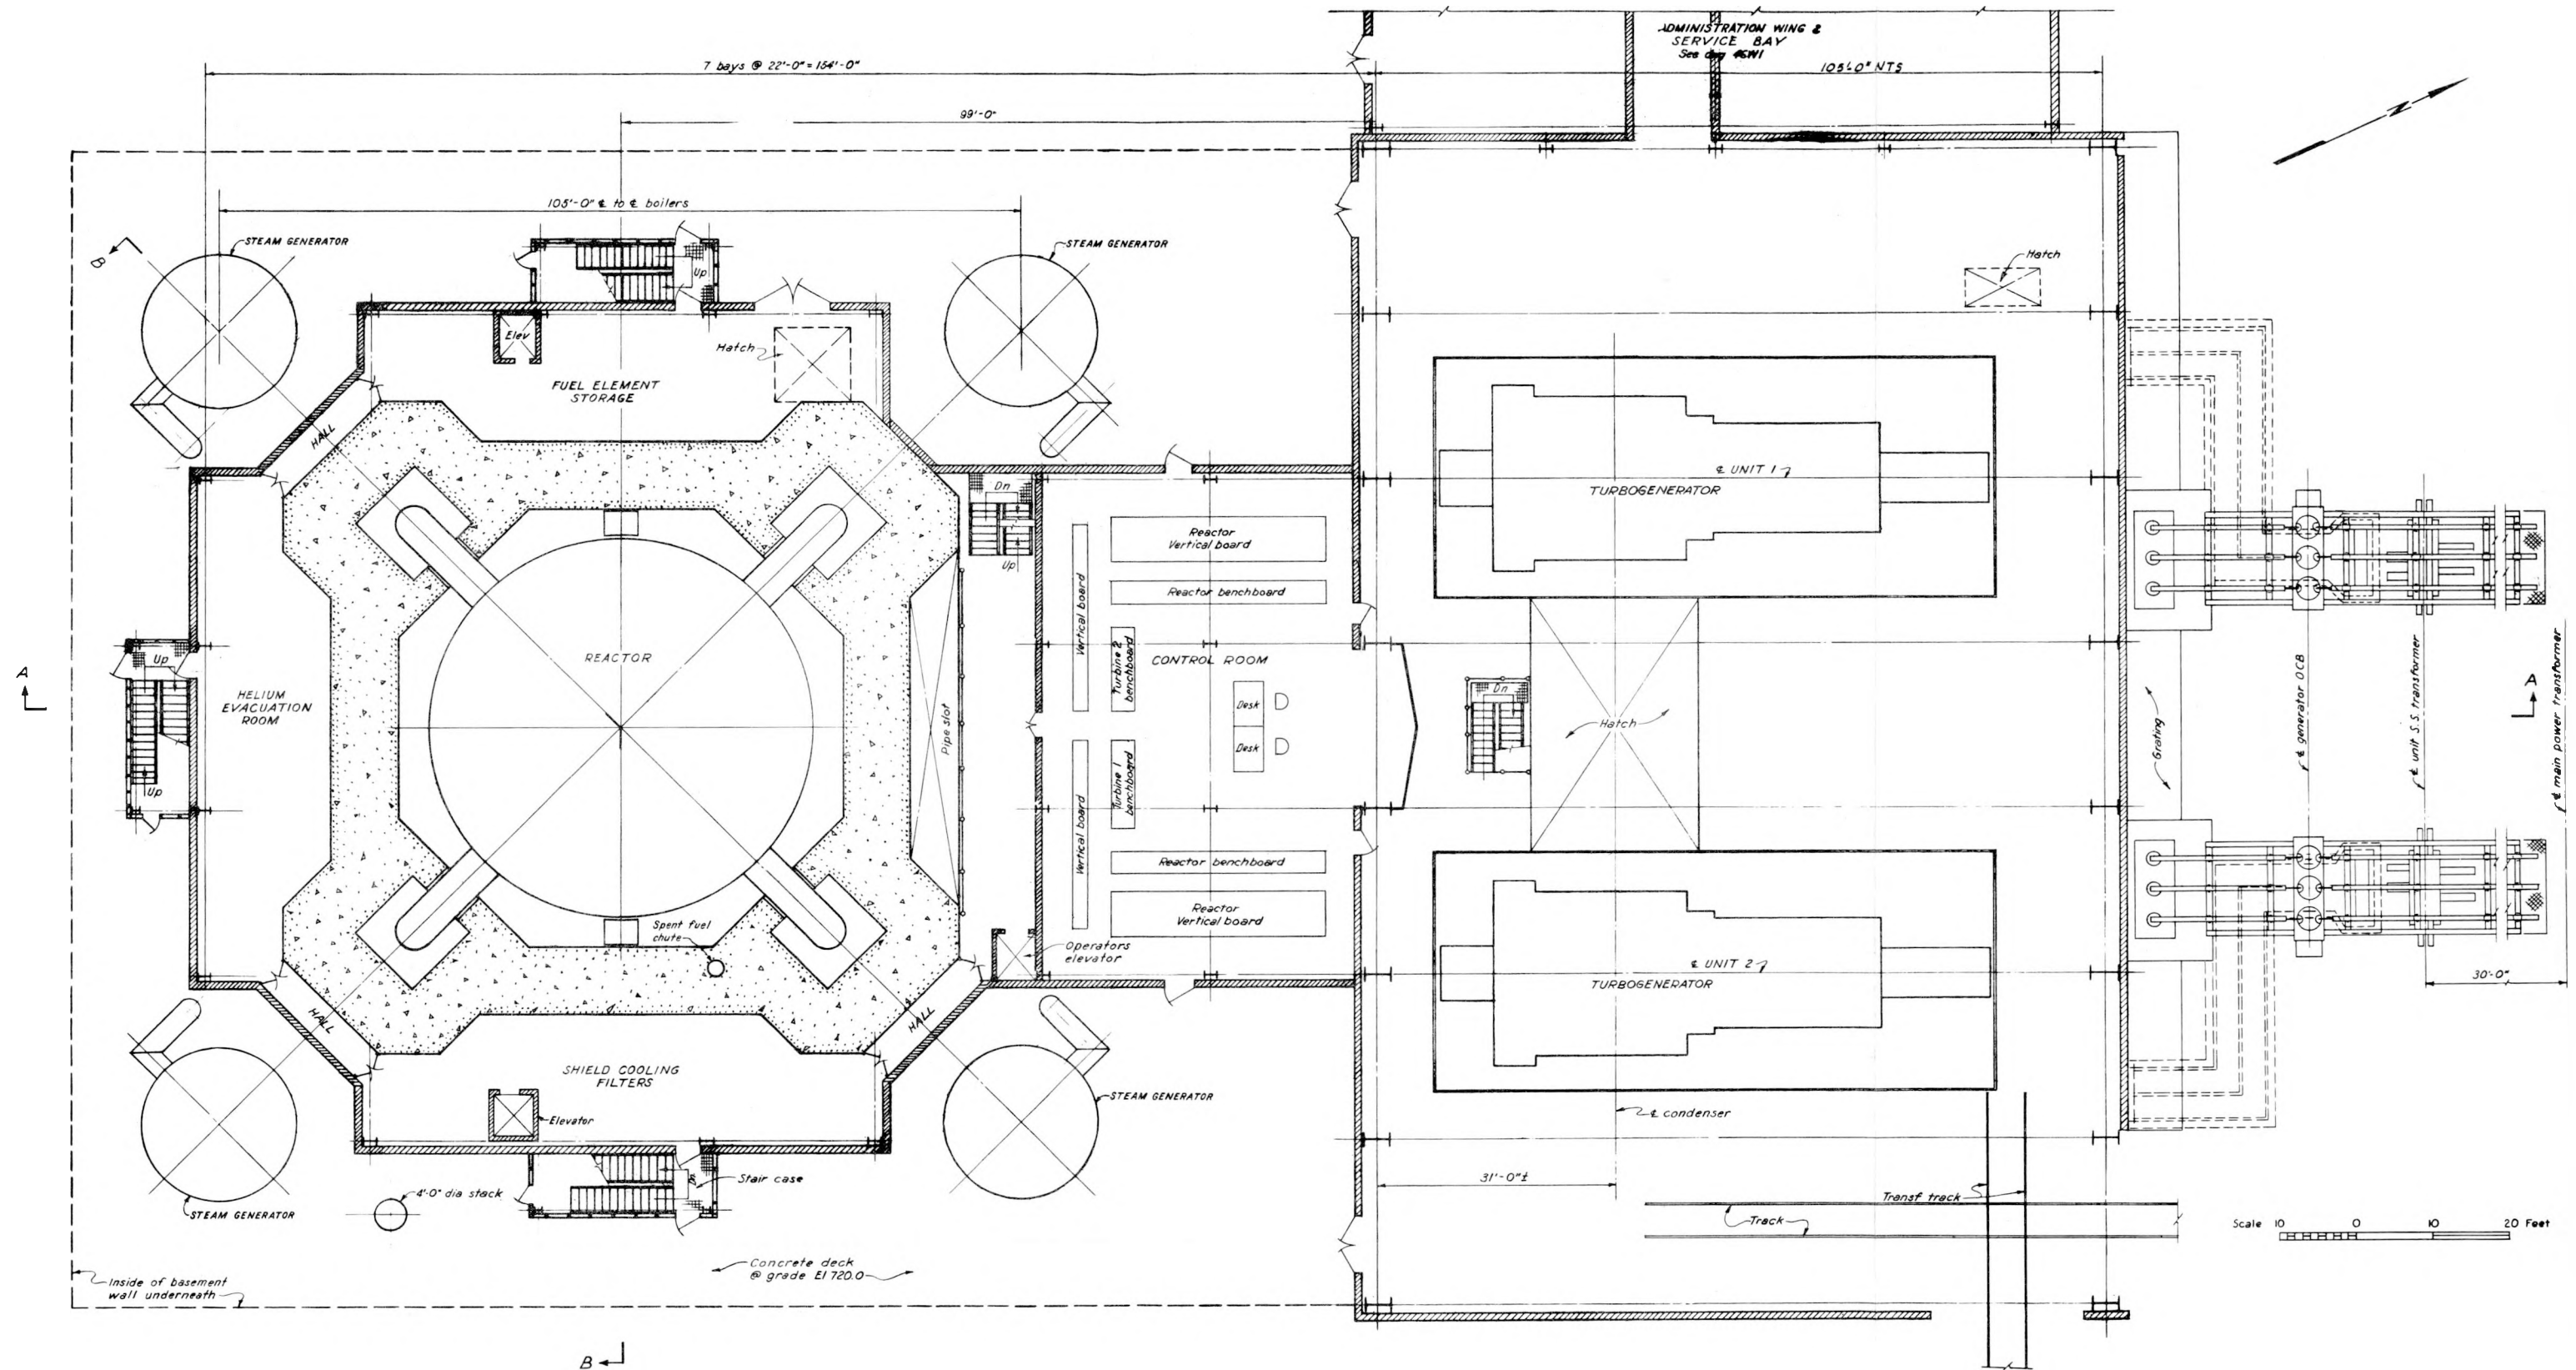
Equipment Layout at Elevation 720.0 (ORNL - GCR-2) (Design Div., Tennessee Valley Authority).
